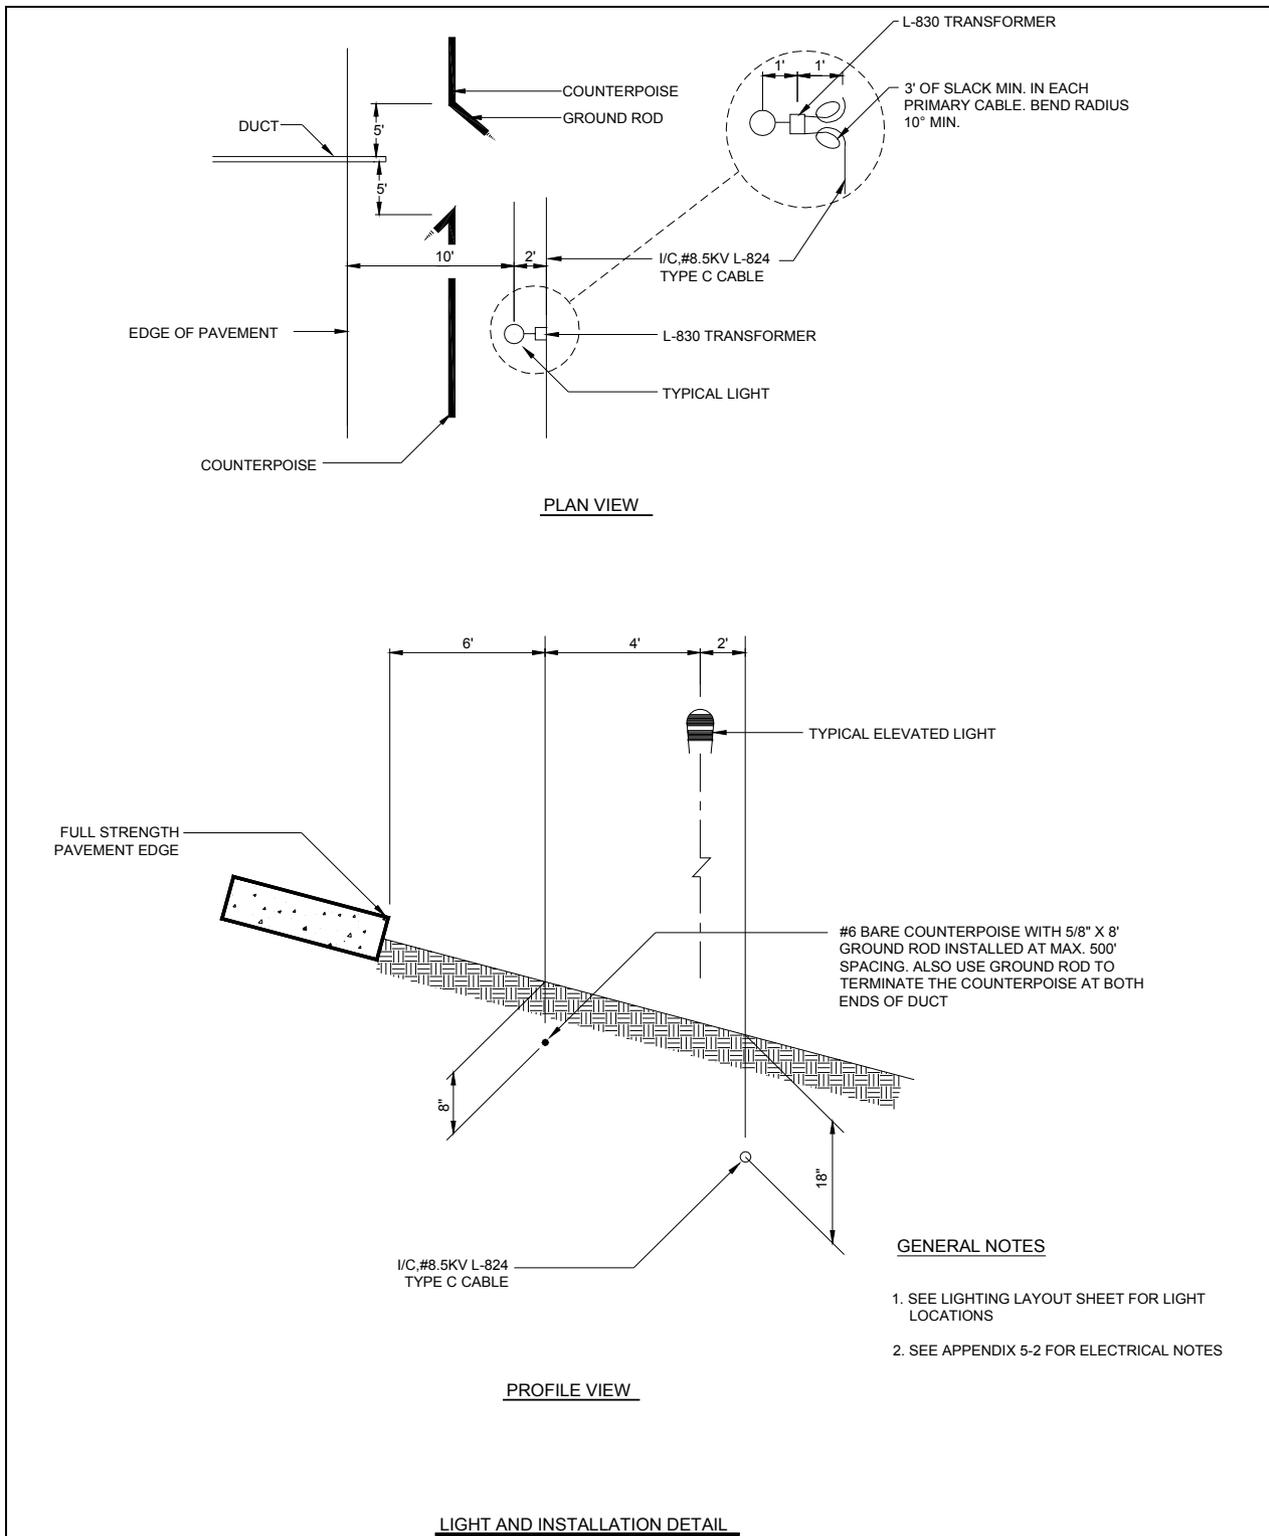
Typical Standard Details for Runway and Taxiway Edge Lights –Light & Installation Detail
